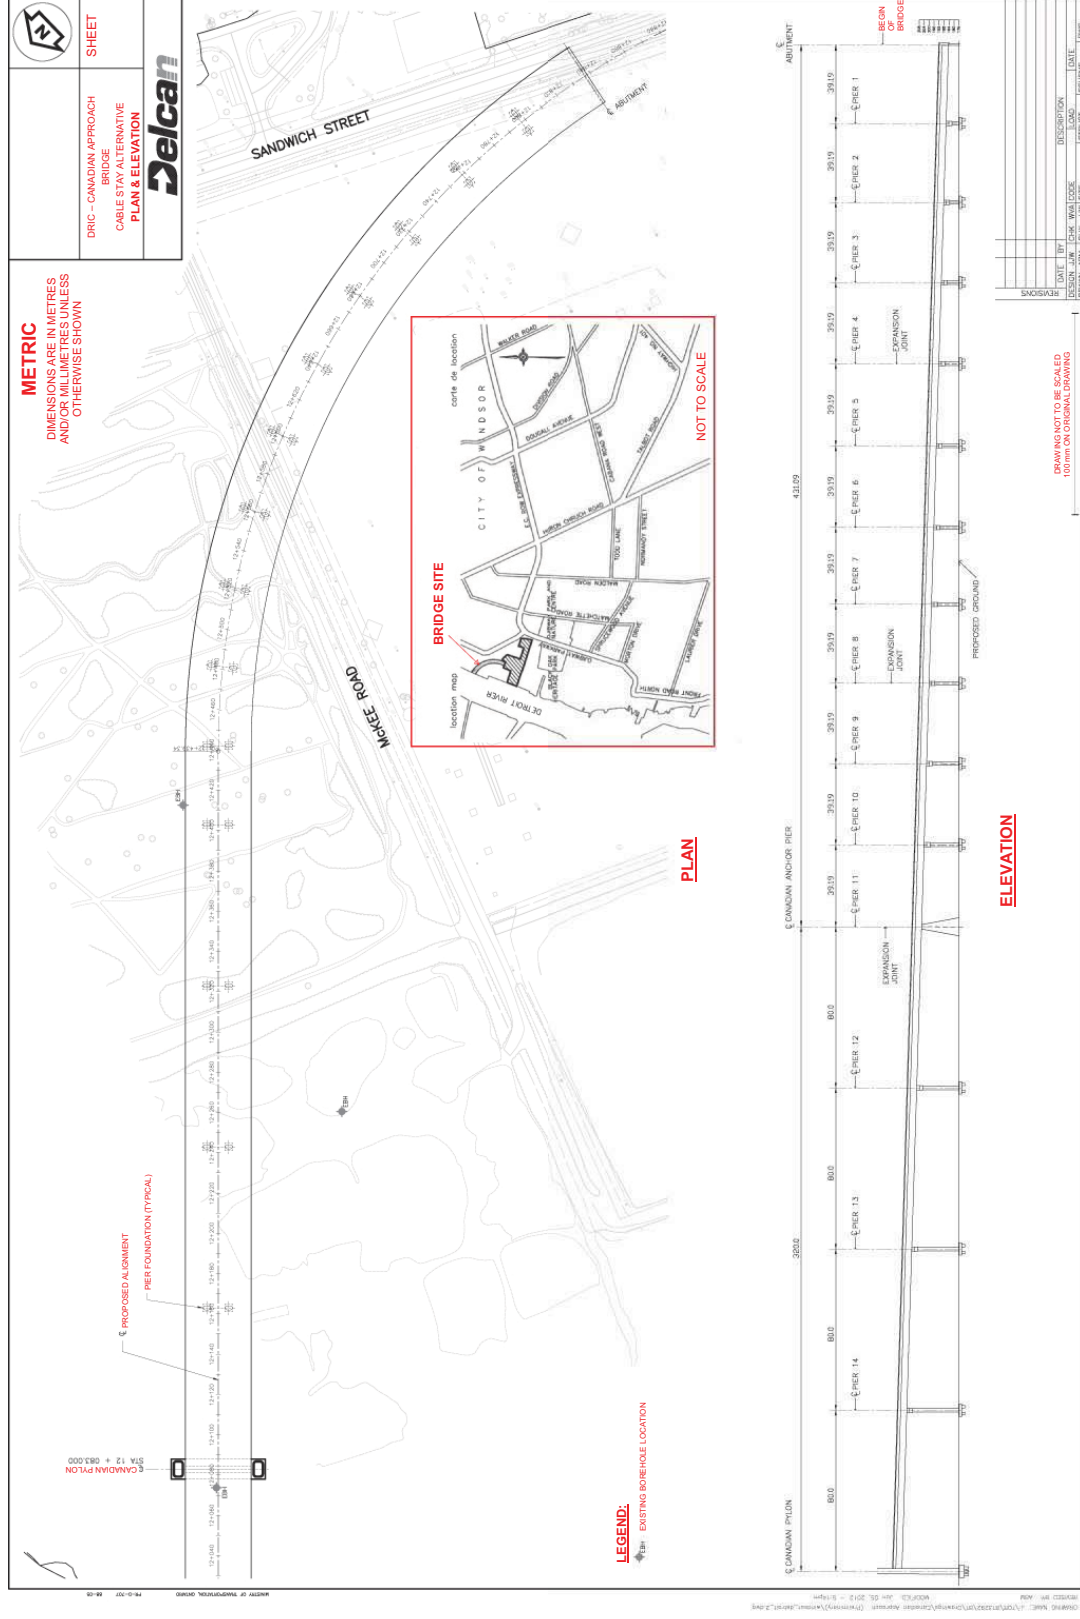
CANADIAN APPROACH BRIDGE (PROPOSED BOREHOLES' PLAN)
